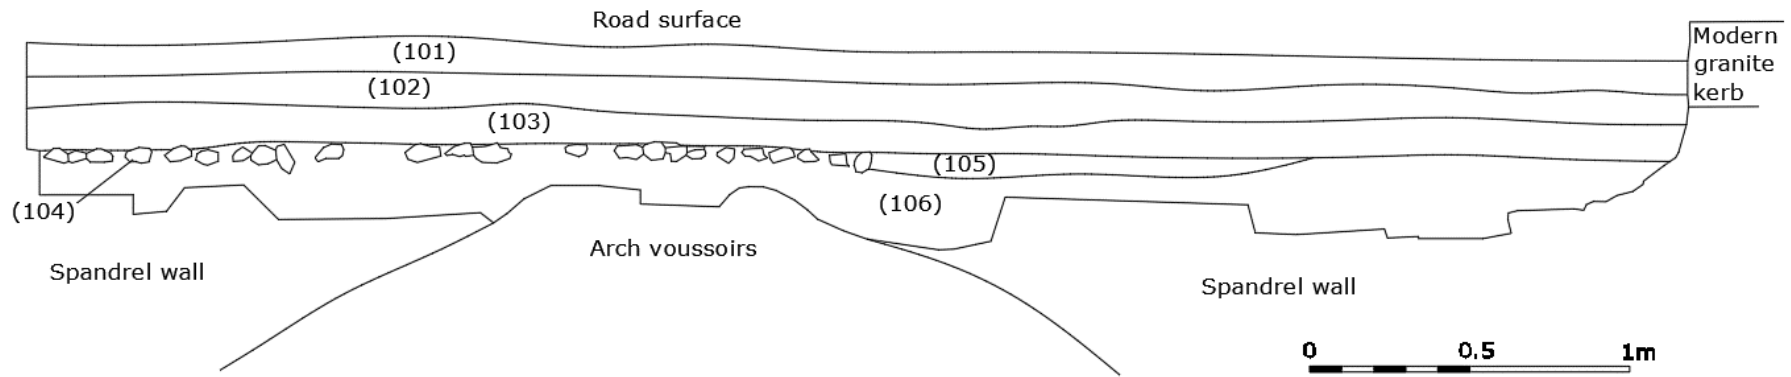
West facing section through road and bridge deck exposed after dismantling.
